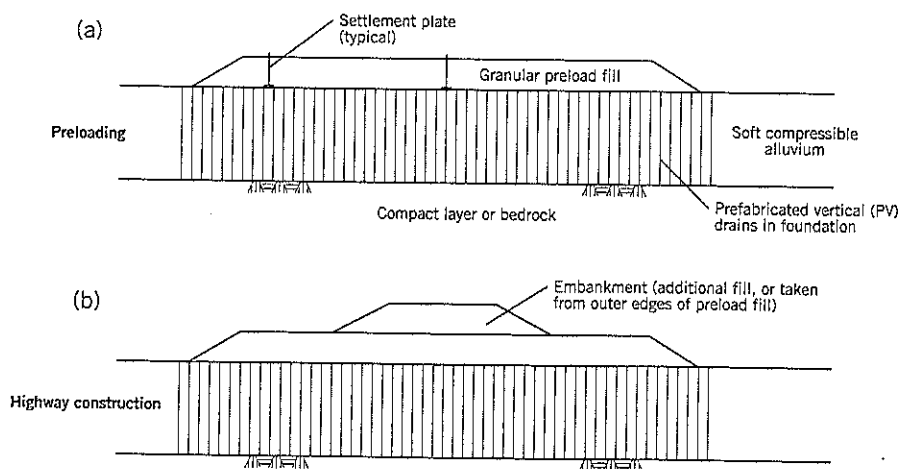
Dewatering (consolidating) a soft compressible alluvial foundation by preloading: (a) preload fill in place (b) highway embankment built above the preload fill (staged construction)
